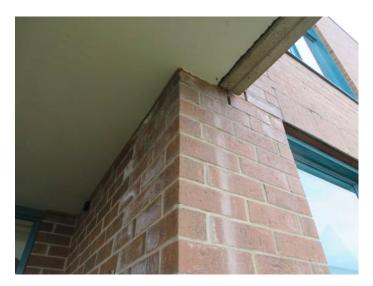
On level P1, under fan EF-4 some water damage is visible.
